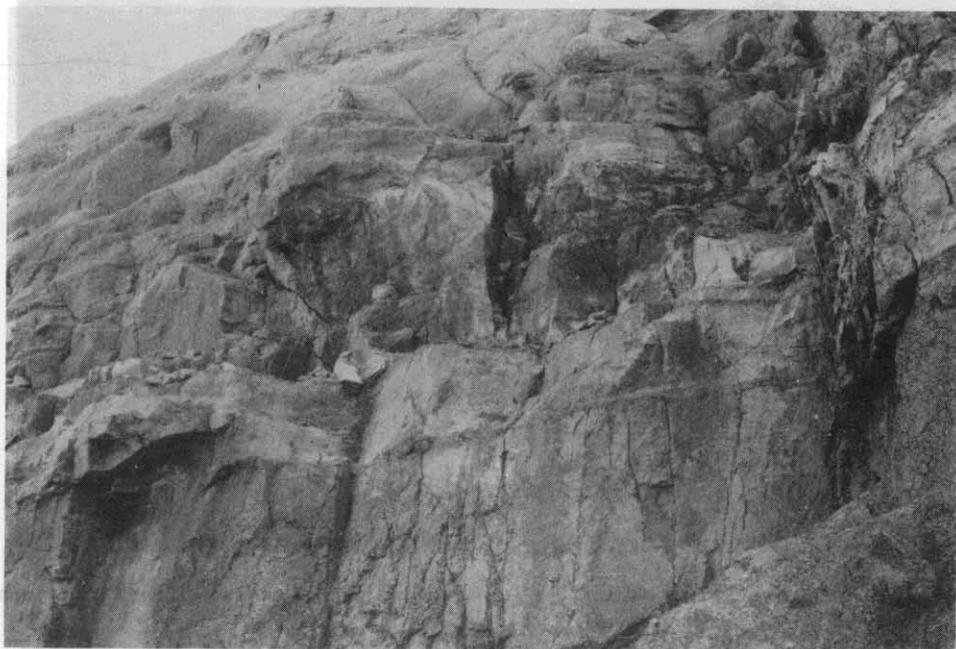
Tunnel Hill cutting. Opening of vertical joints.
